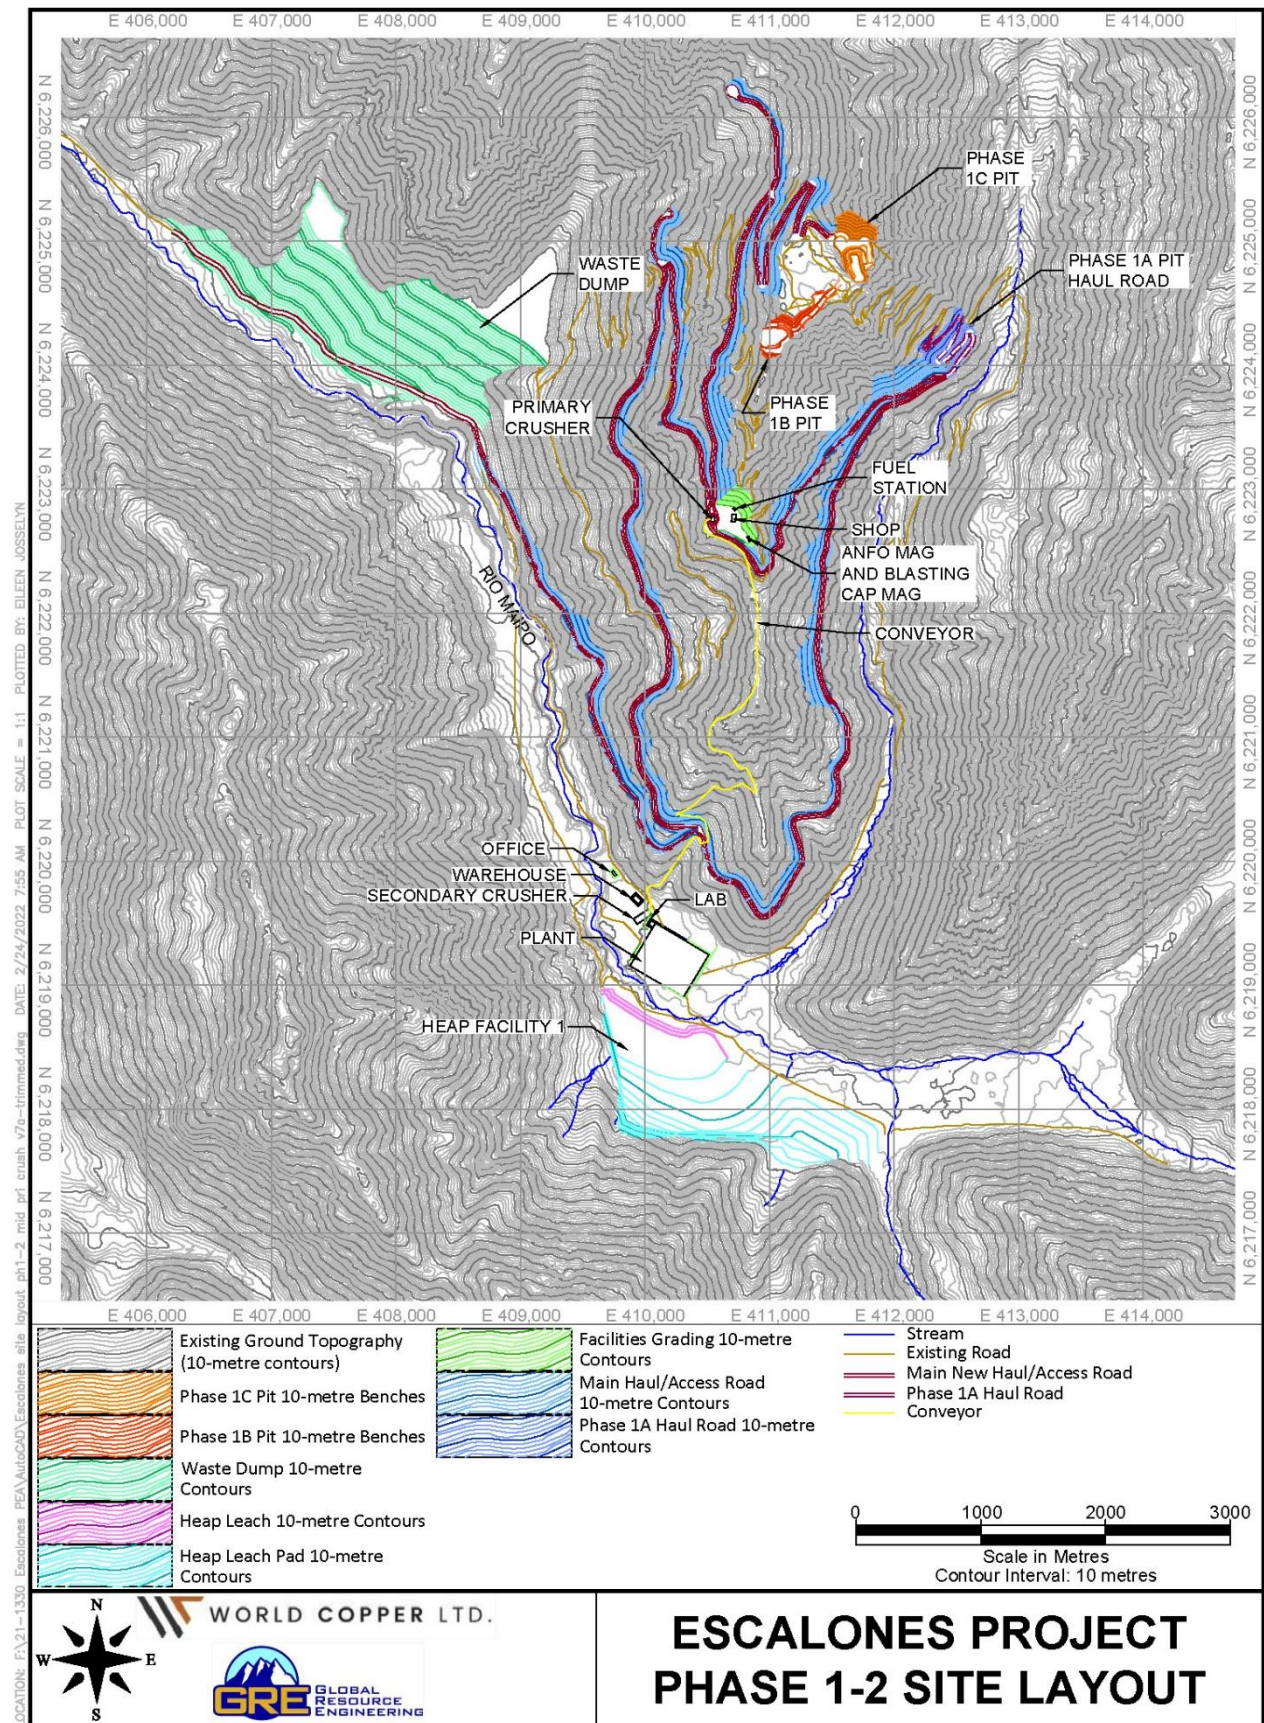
Escalones Copper Project Phase 1-3 Site Layout
